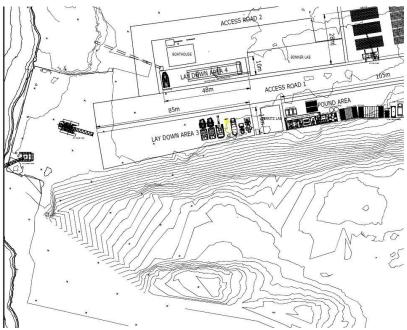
Laydown area 3 is designated for quarry processing plant.
